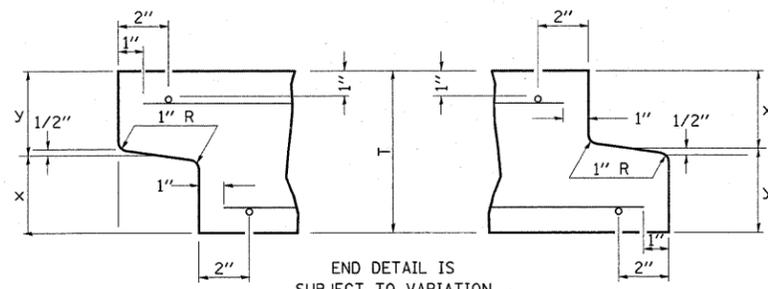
DETAIL OF PRECAST CONCRETE BOX CULVERT M259
